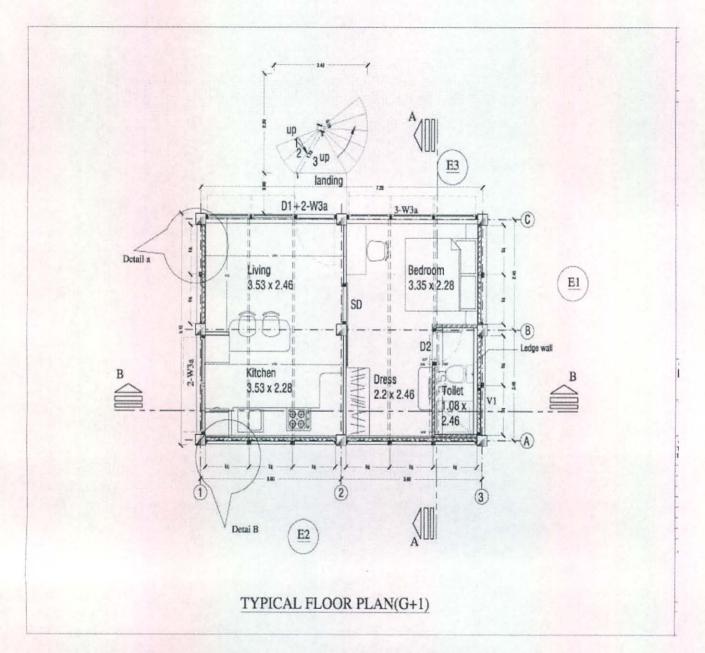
Detailed plan of the Ground floor and the first floor (repetition).
